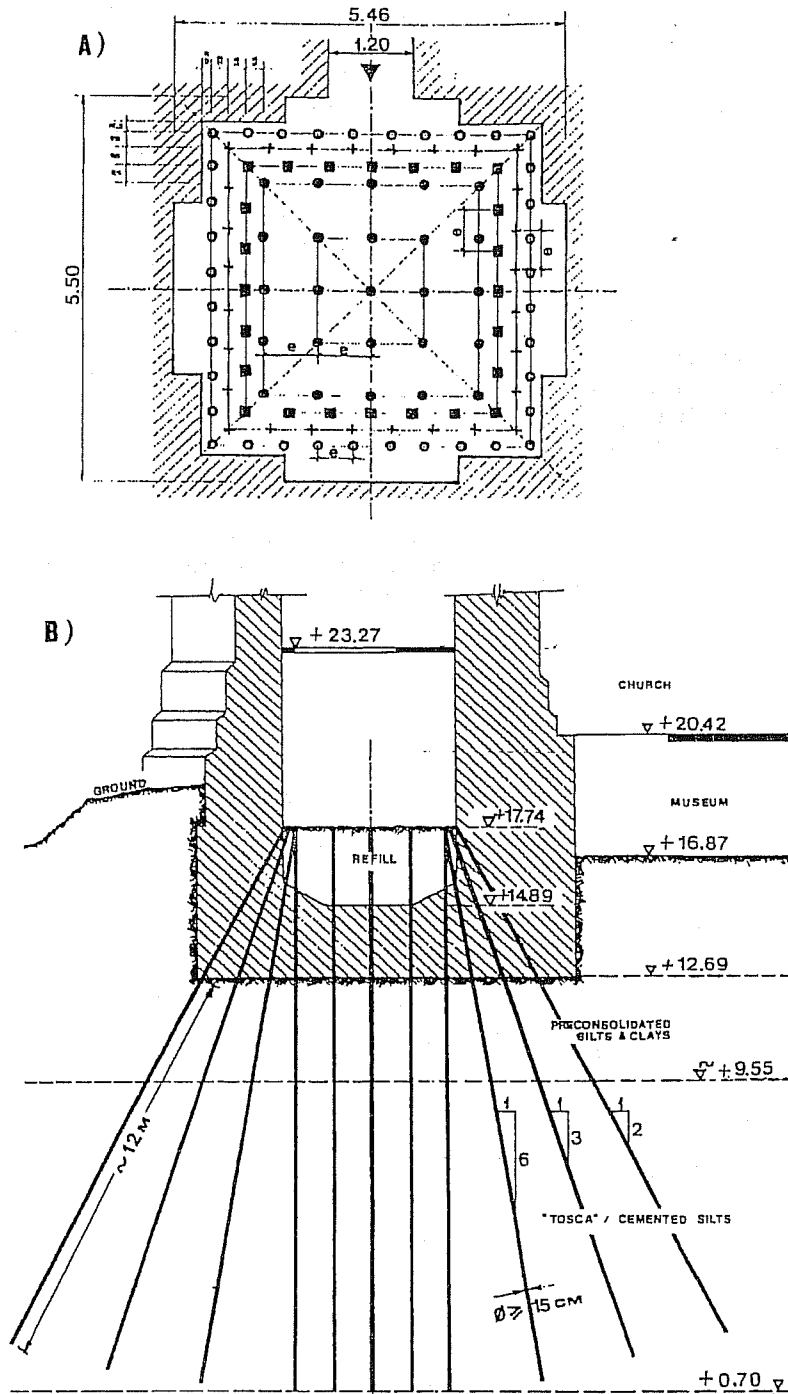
Tower 51. Reinforced foundation with micropiles: a) Plan; b) Section.
